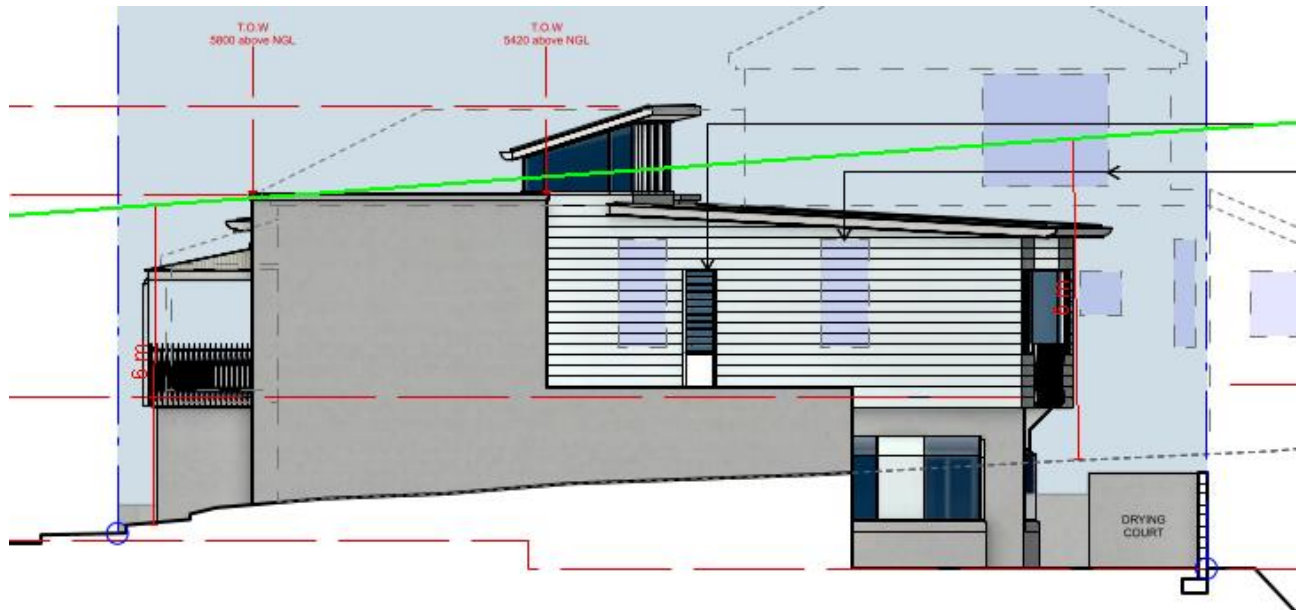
3D view of proposed dwelling and adjoining property.
